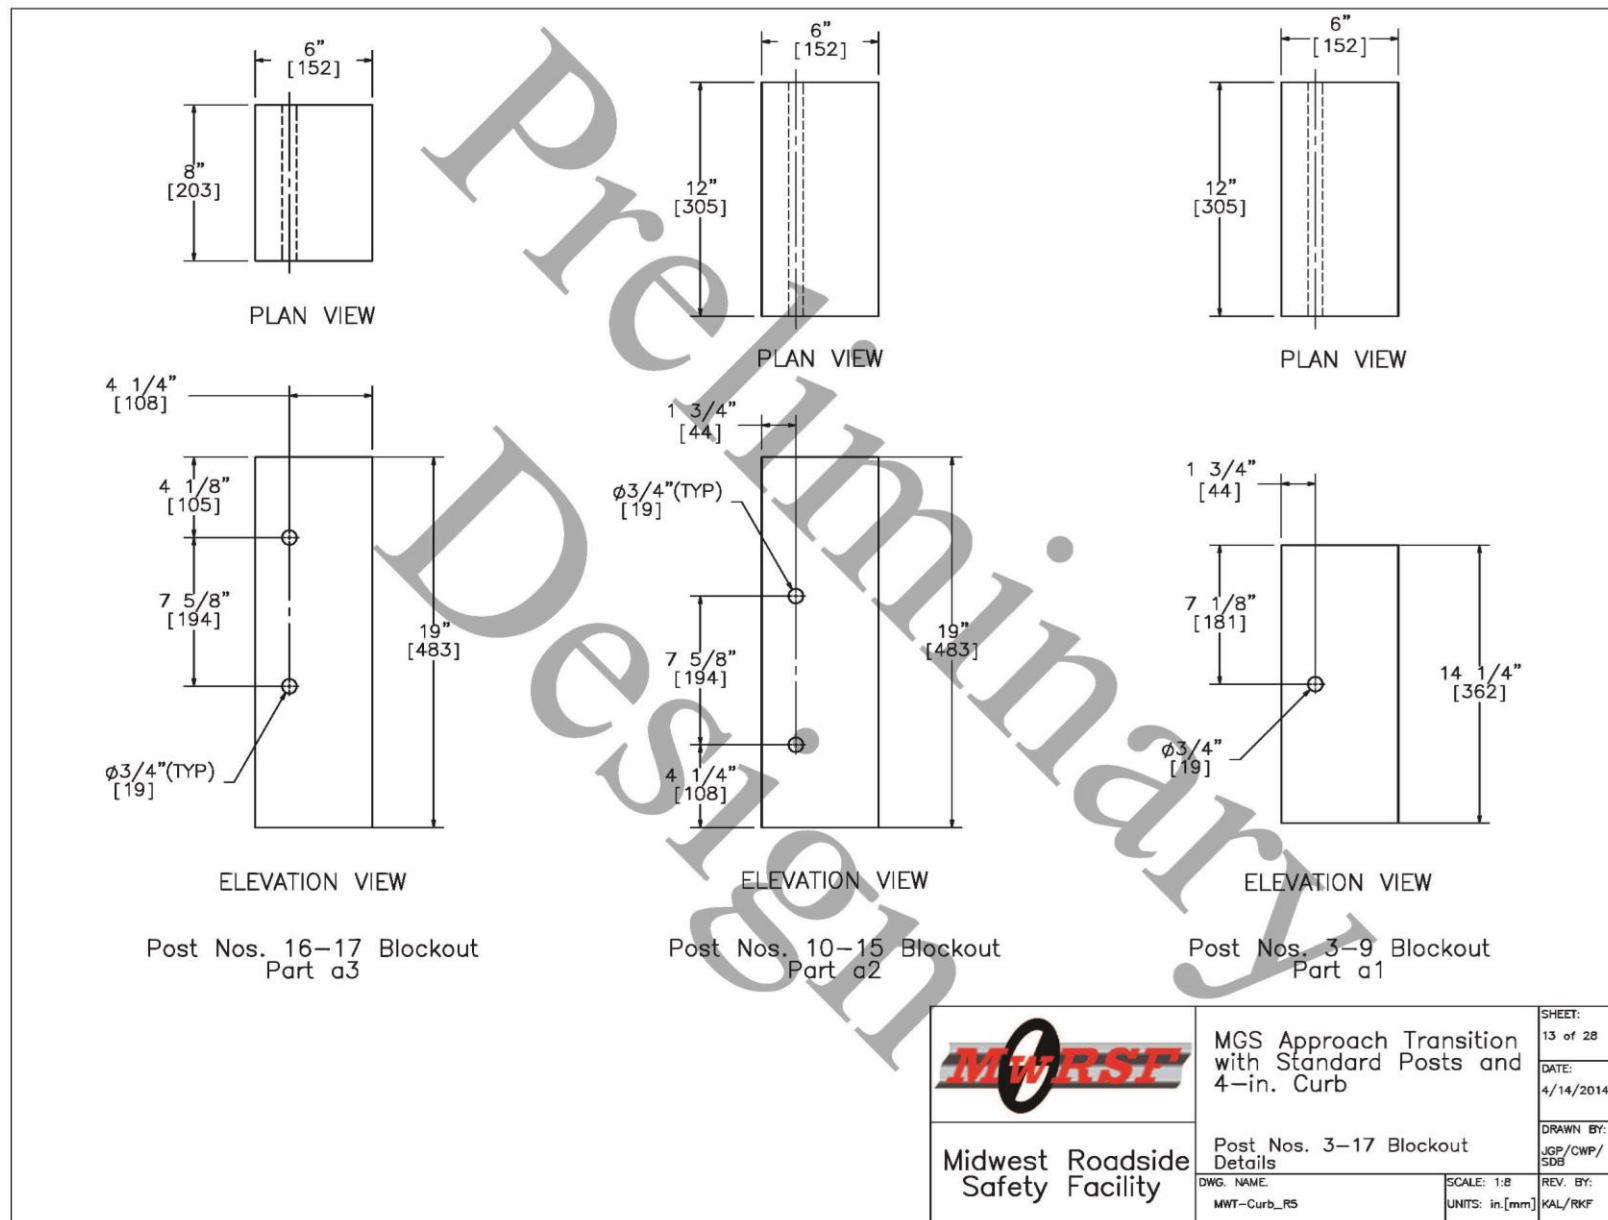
Post Nos. 3 through 17 Blockout Details, Test No. MWTC-1
